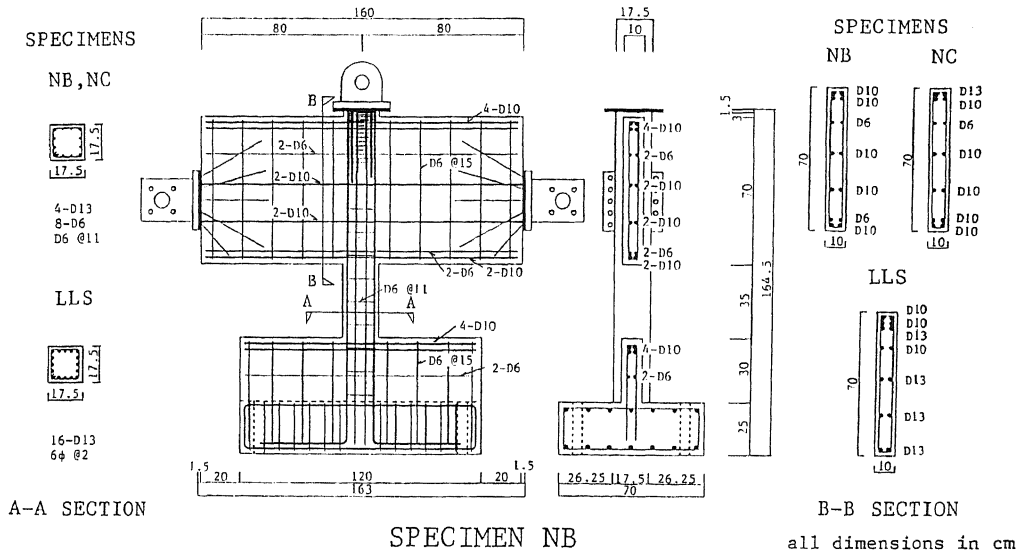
Subassembly Test Specimen and Cross-sectional Details
